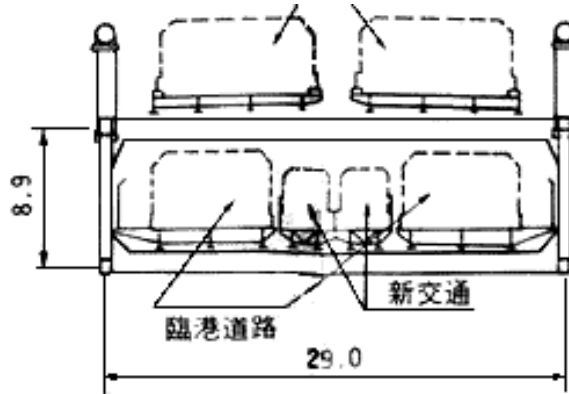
Tokyo Rainbow Bridge's typical double-deck section [39].
